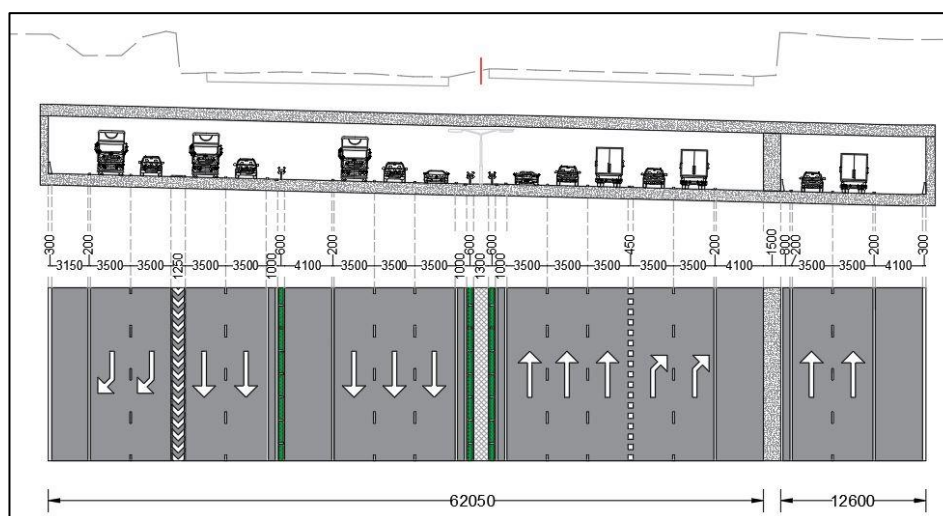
The alternative with an intermediate support outside the U-shaped concrete structure.
